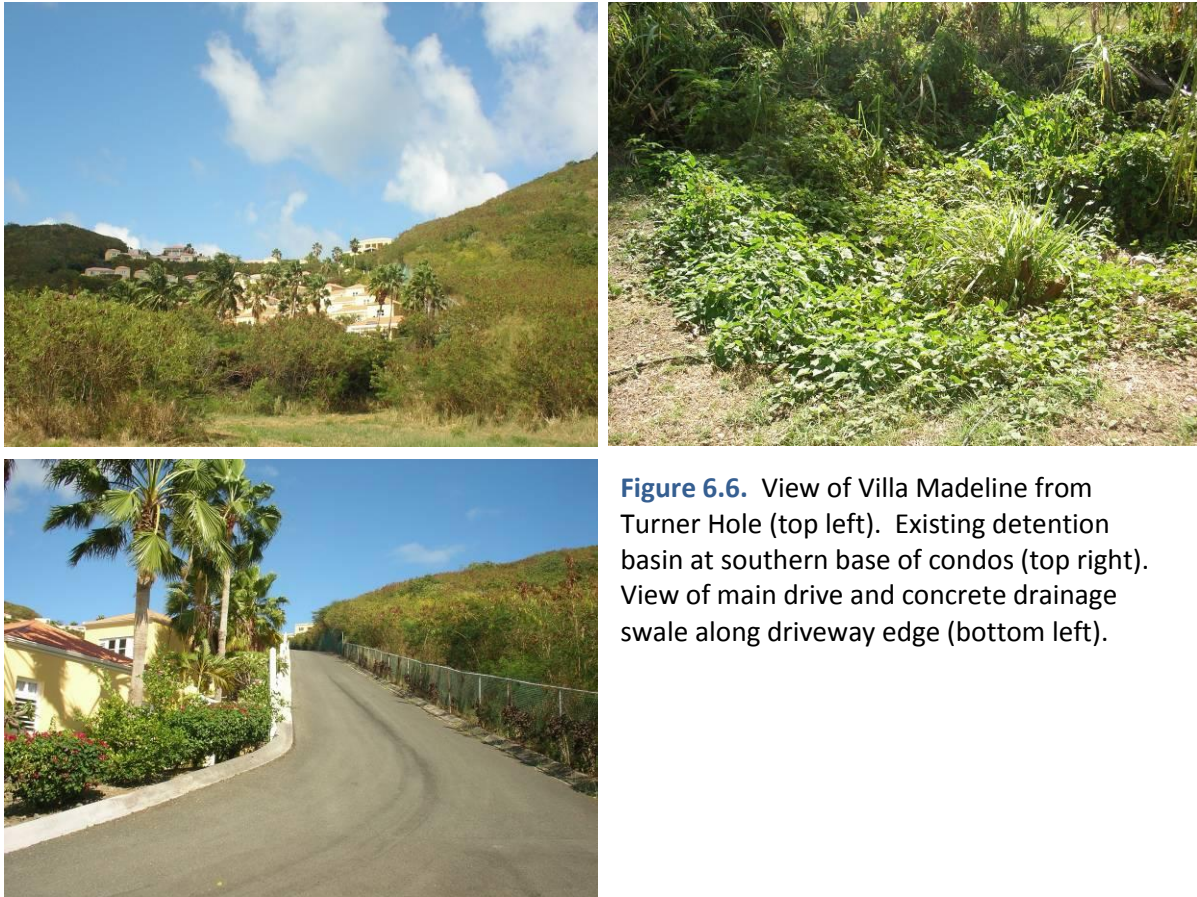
View of Villa Madeline from Turner Hole (top left). Existing detention basin at southern base of condos (top right). View of main drive and concrete drainage swale along driveway edge (bottom left).
